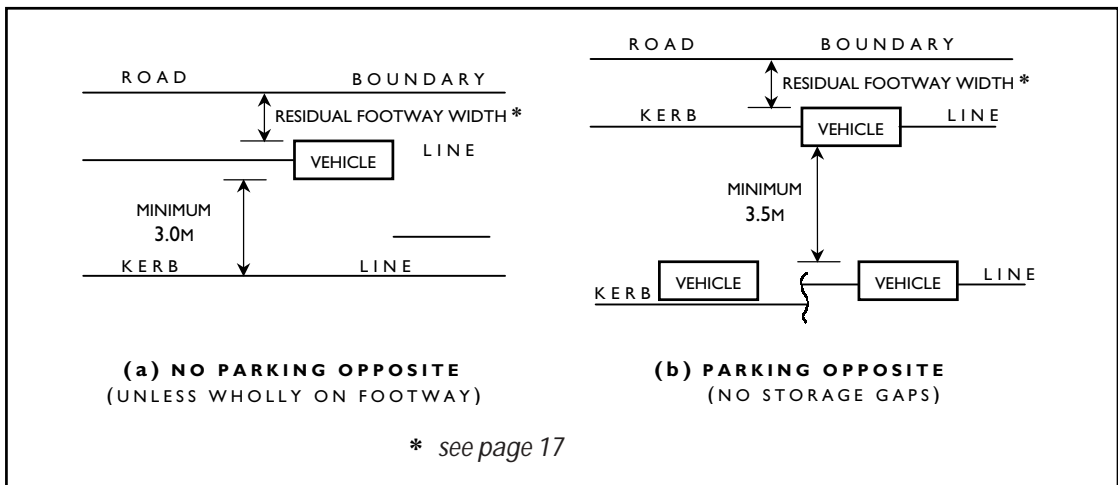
Proposed minimum clearances for vehicle row parked straddling the kerb line (one-way road).
